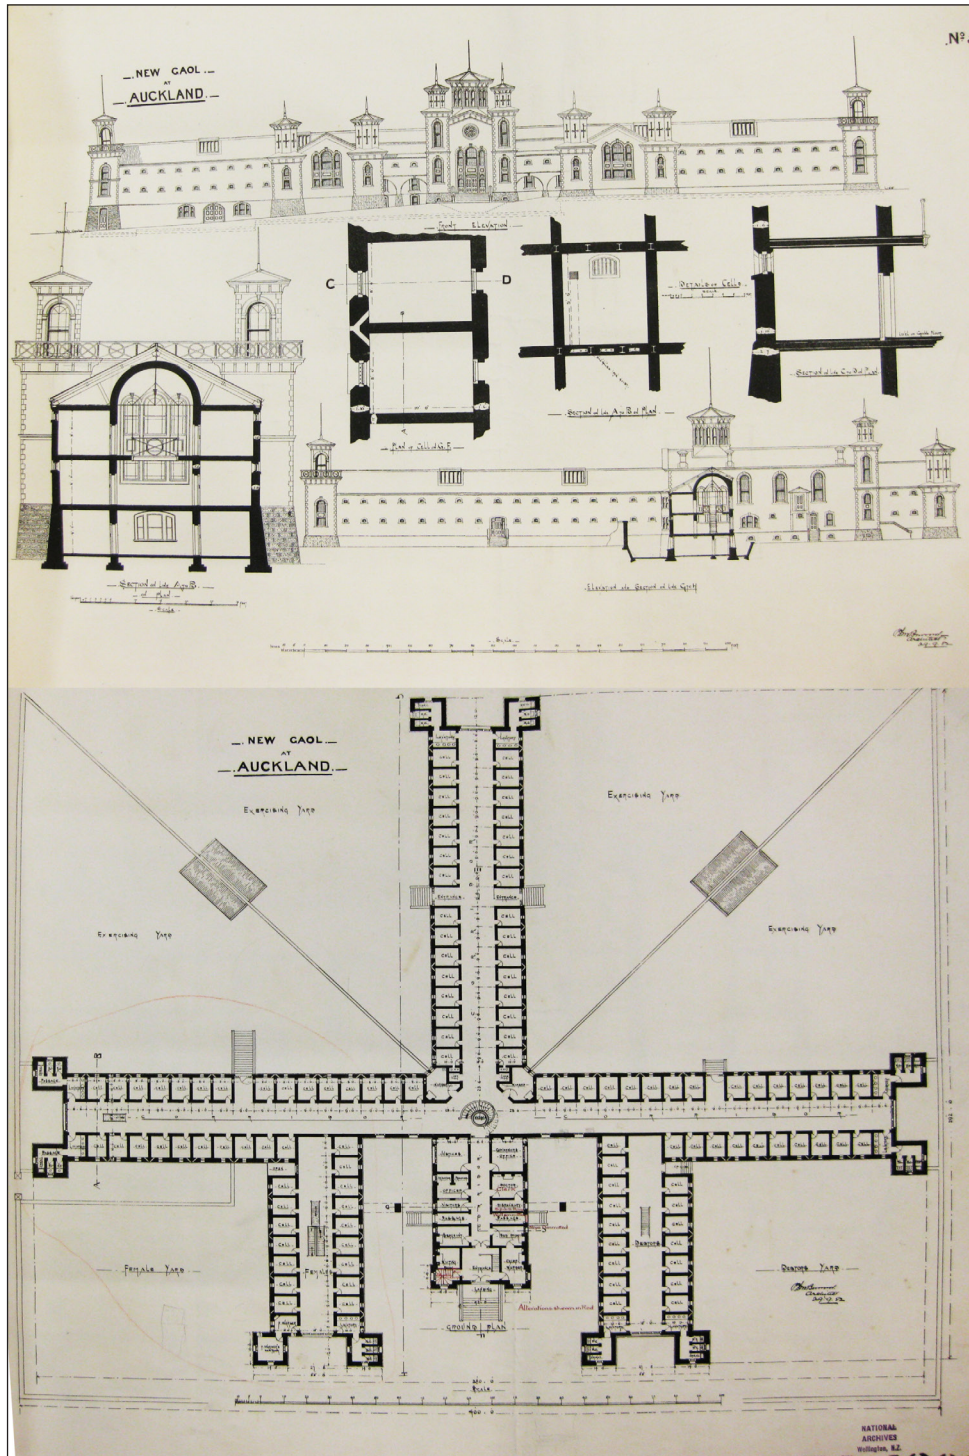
Burrows’ plans of Mt Eden Prison showing proposed frontage and ground floor (photographed from Archives NZ).
